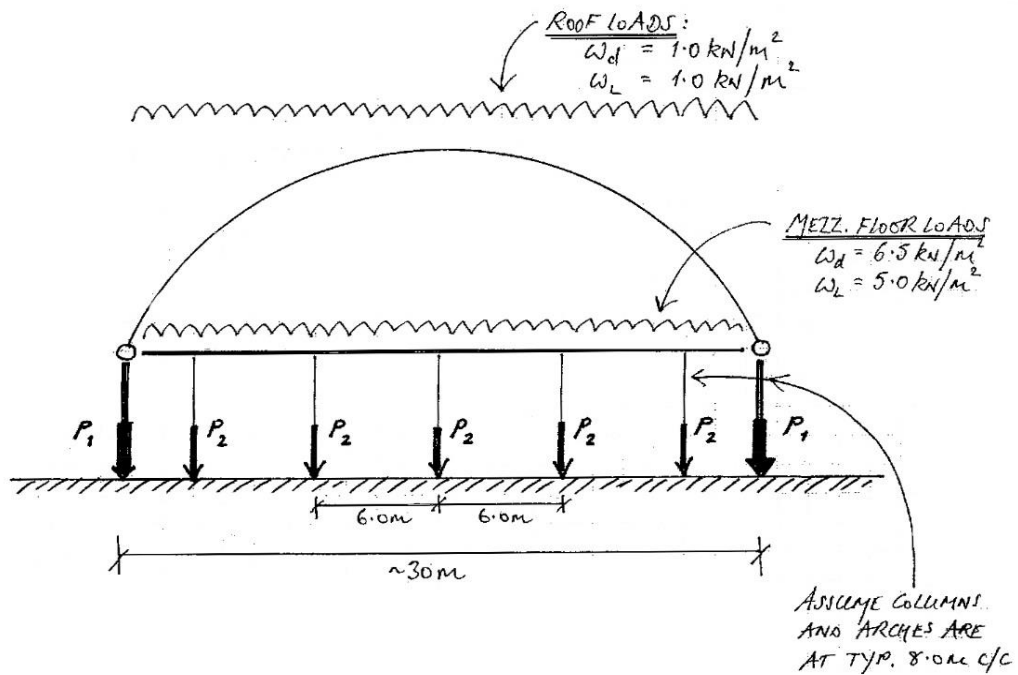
shows the configuration of the Arch and Mezzanine column loads
